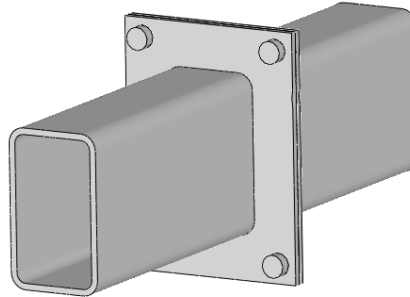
End plated splice with corner bolts for a rectangular tube.
